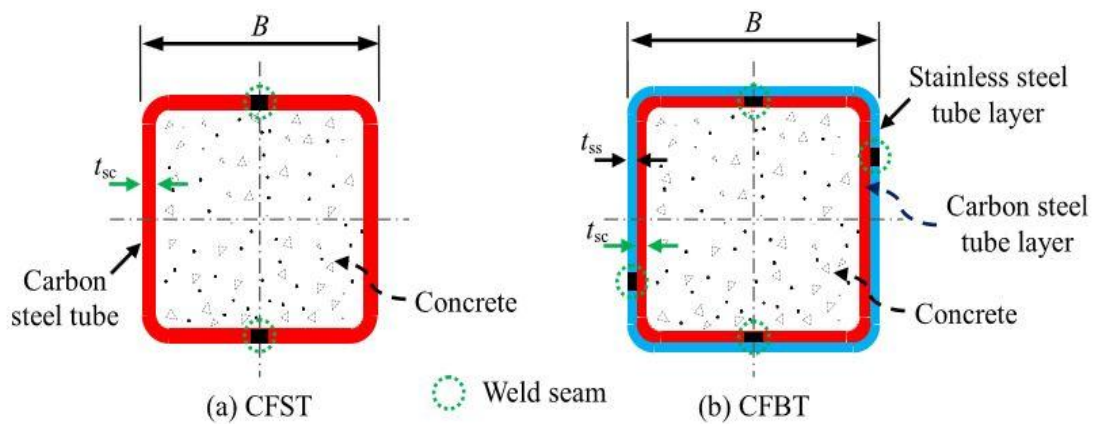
Cross Sections of Square CFST and CFBT Columns [1]
